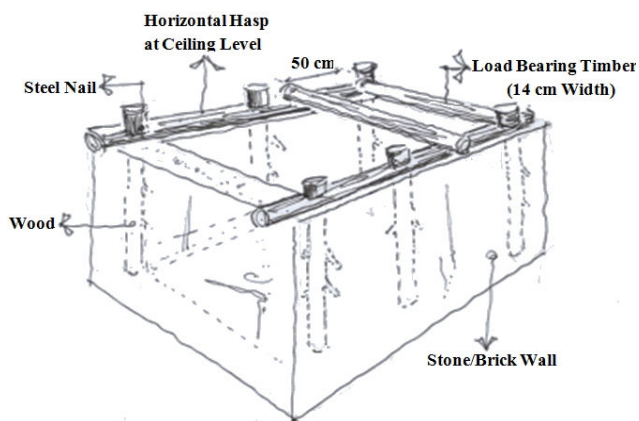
Horizontal & vertical hasps in load bearing walls in Ush Tobin Village Houses
